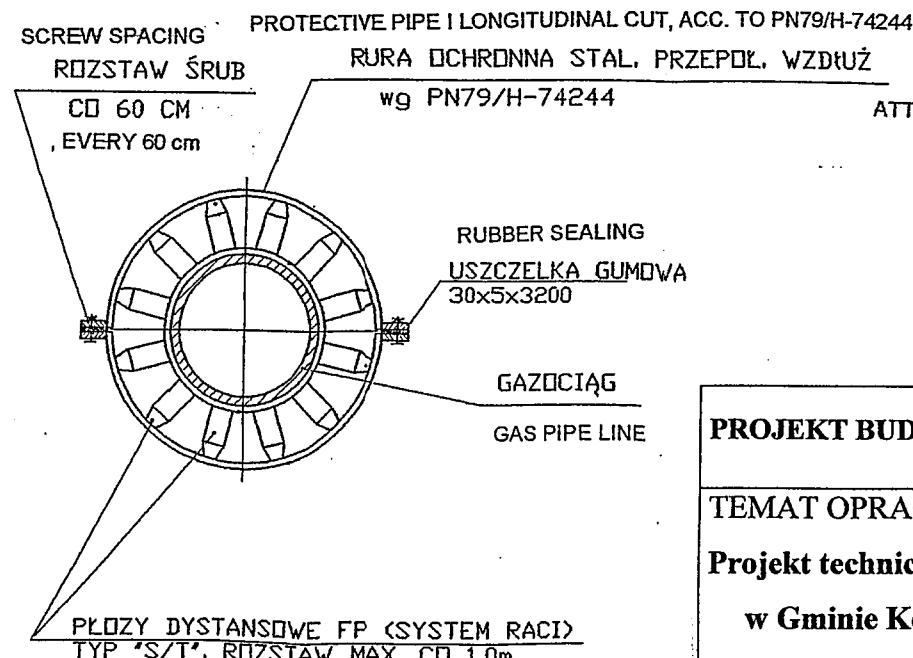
DETAIL OF SEALING PROTECTIVE PIPE ENDINGS, SCALE 1:10
